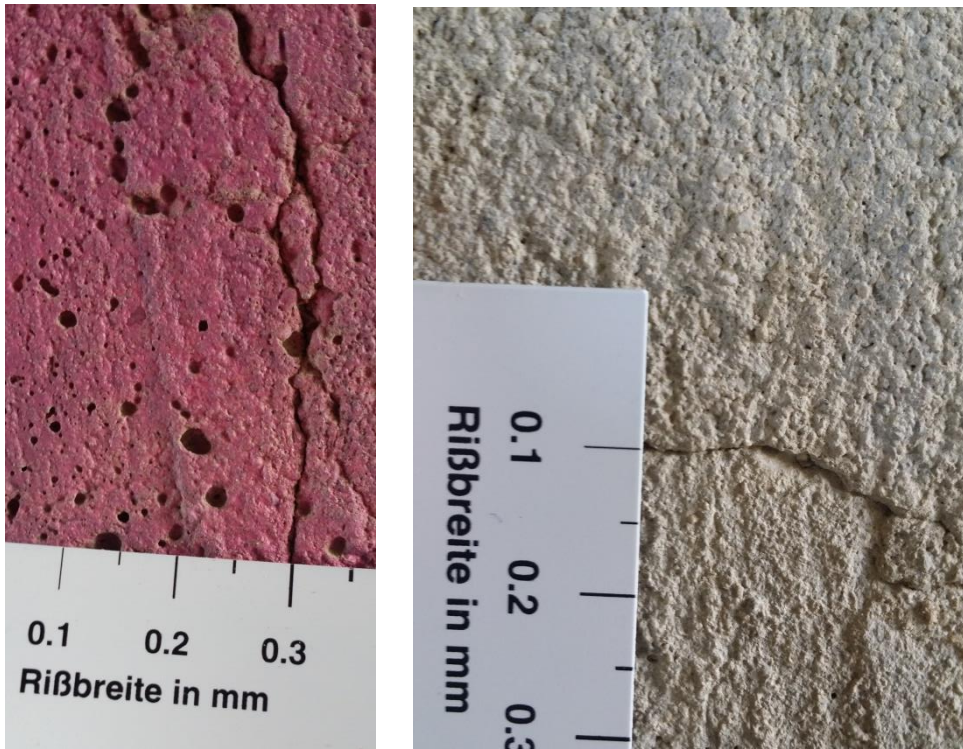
Cracks in bridge 12-926-1. Left is in front wall and right is transversal crack in front wall.
